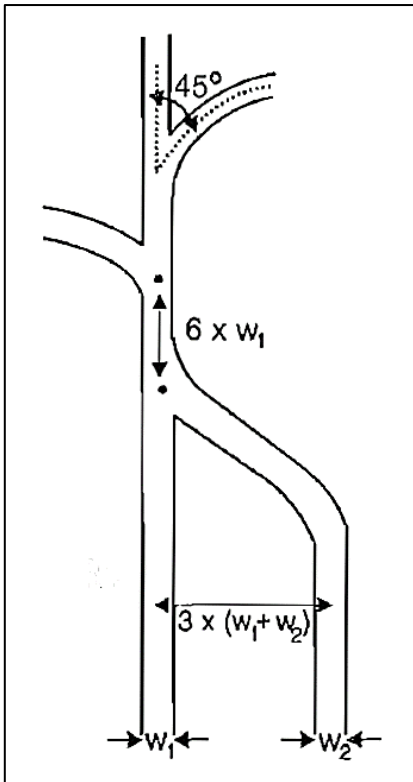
Layout of tunnels to avoid stress interactions between access excavations (Jager & Ryder, 1999).
